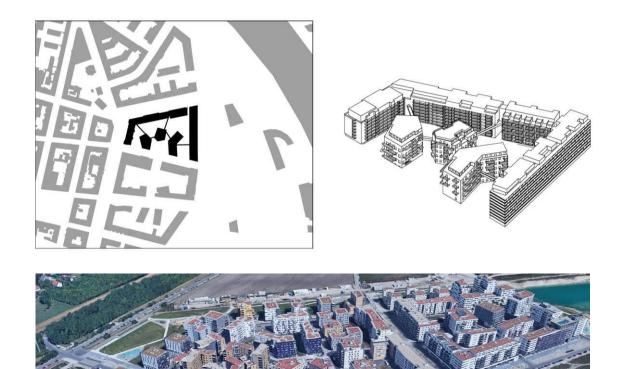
Figure ground and axonometric of Living Room' Sonnewendviertel (by the author) Fig. 3.2.4.2 Aerial view of a new town in Vienna: Seestadt Aspern (Google maps)
